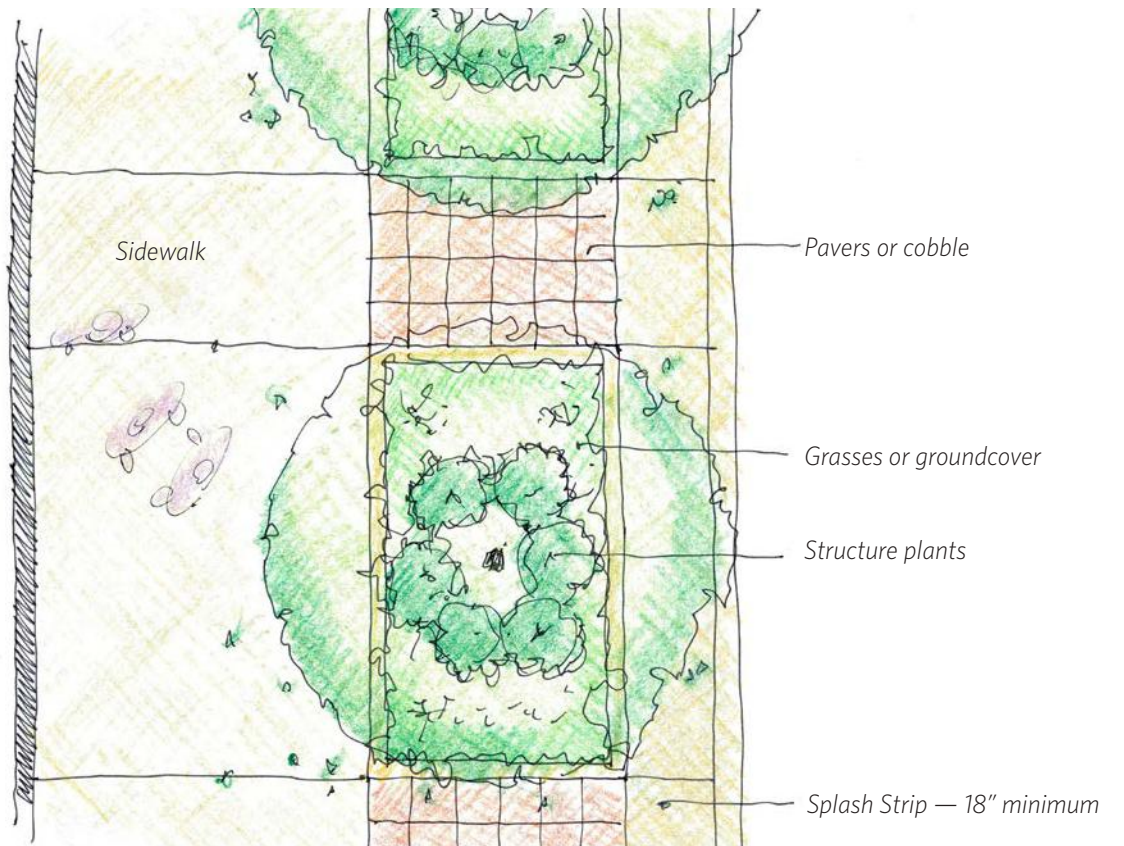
Street Tree Planting Details with Soil Cells — Plan
